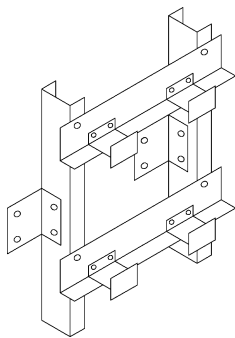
Subframe and fixing kit type 3 (with horizontal profile)
